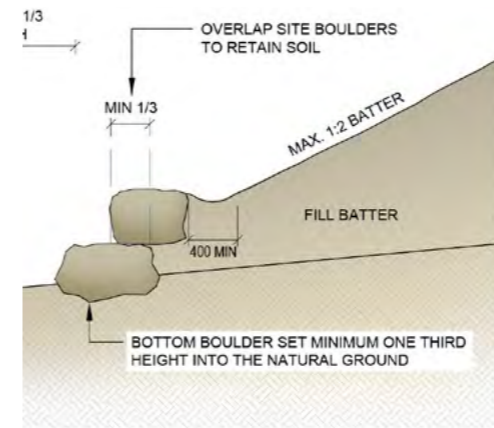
Dry rock retaining would reduce impact on trees and minimise extent of fill
